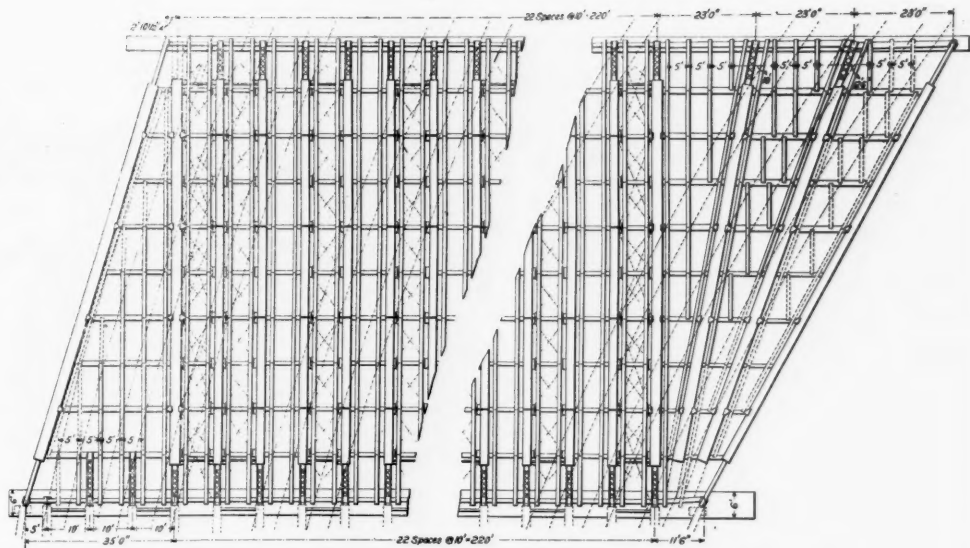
Plan of Woonasquatucket River Bridge, Showing Typical and Skew Girders.
